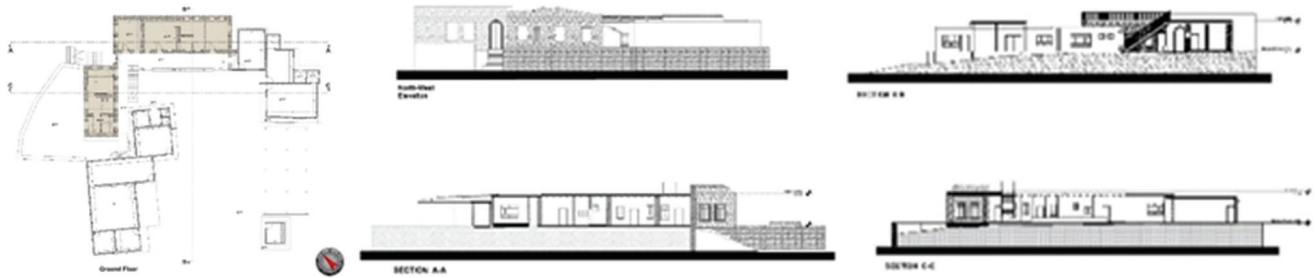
Plan, sections, elevation of unit A3, [researcher].
